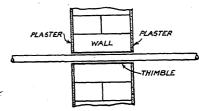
ALLOWING FOR EXPANSION OF PIPE THROUGH WALL
